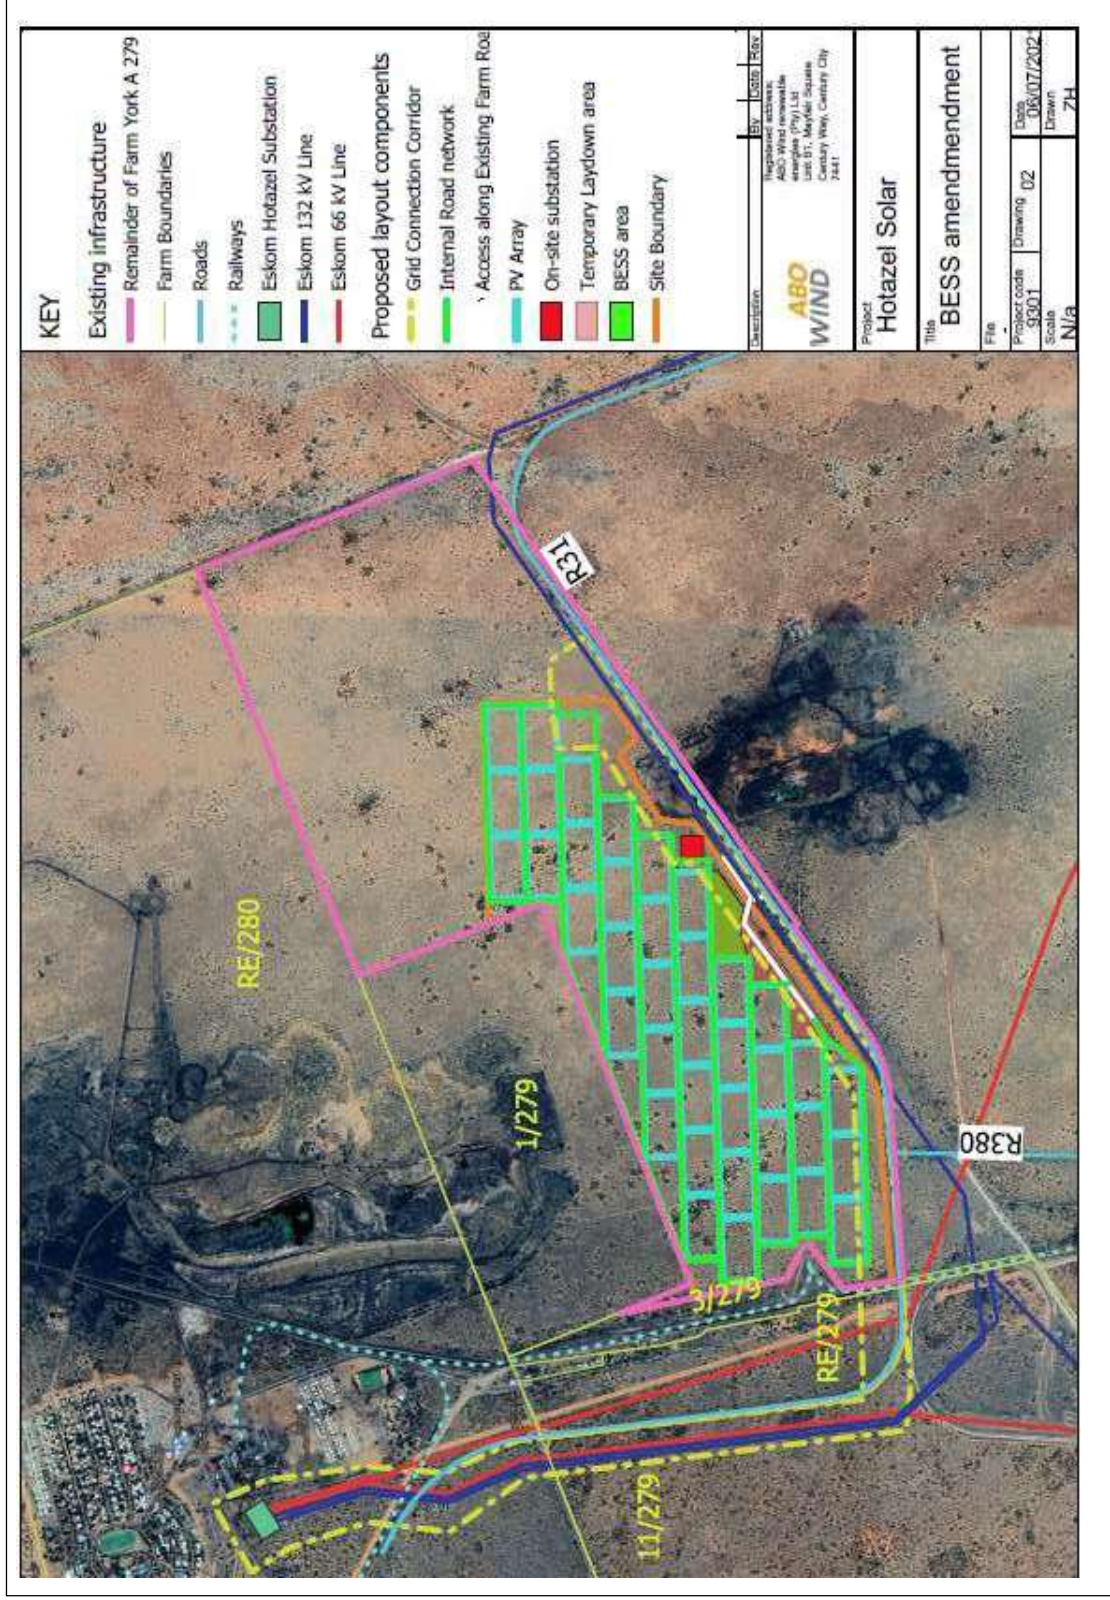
Facility layout showing the authorised as well as the proposed infrastructure
